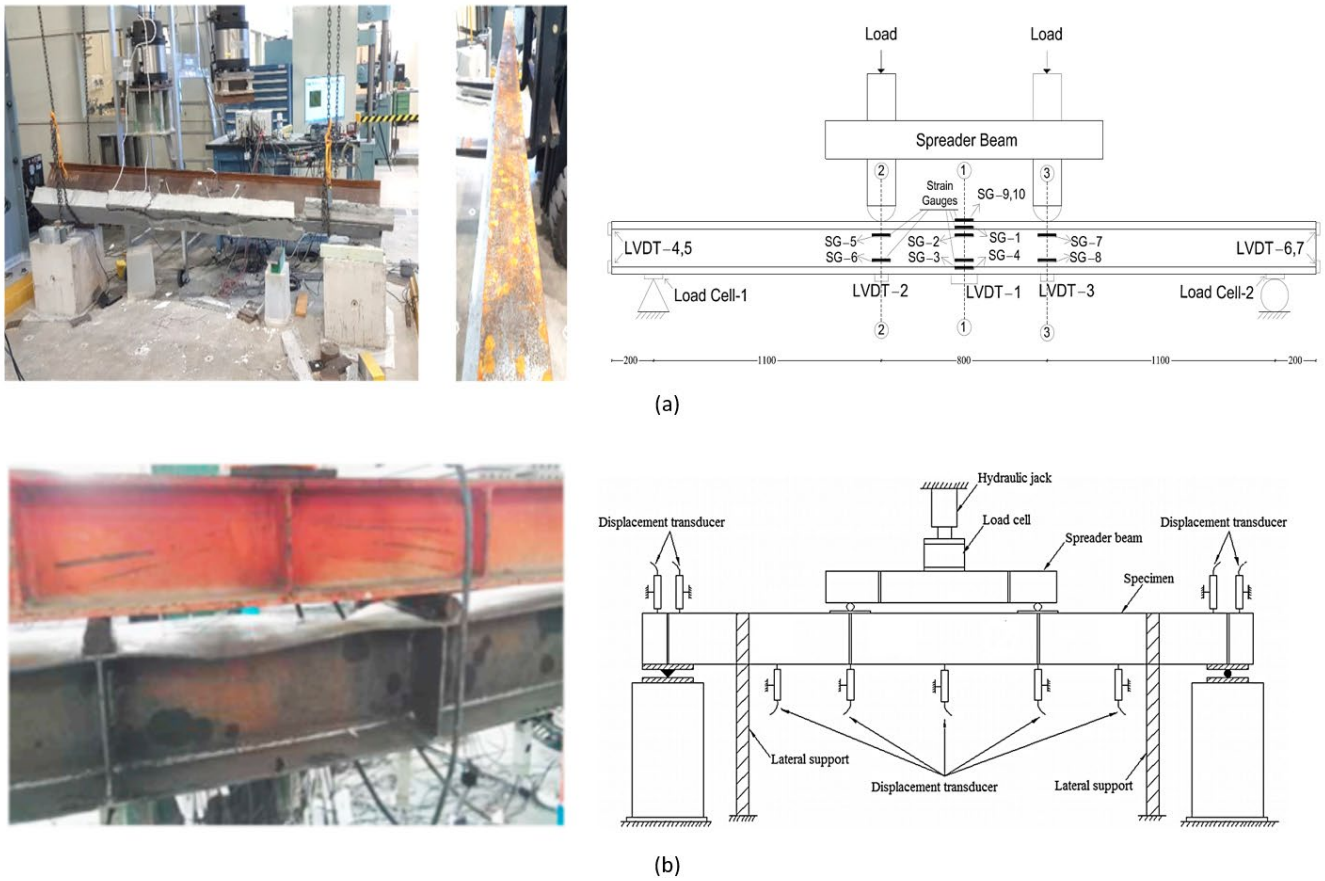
Details of steel beams specimens for validating the FE analysis (Dimensions are measured in mm): (a) Assembly E30-p tested by Kabir et al. 2021; (b) Assembly TQ-HW-d0-B4 tested by Feng et al. 2018.
